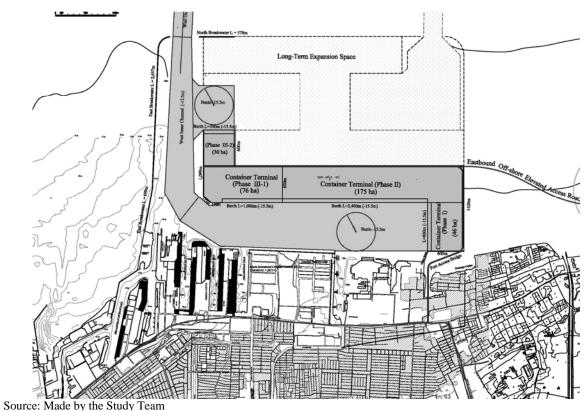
Facility Layout Plan of North Kalibaru Expansion in 2030 (Alternative-2)
